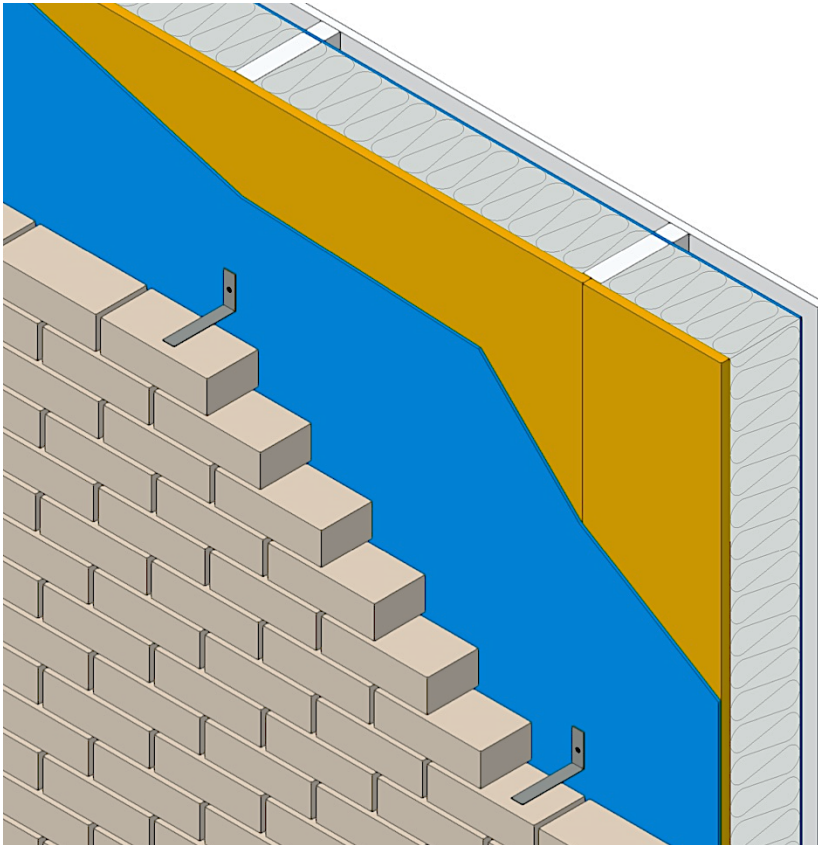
Brick outer leaf tied to timber framed wall panels at studs and headers
